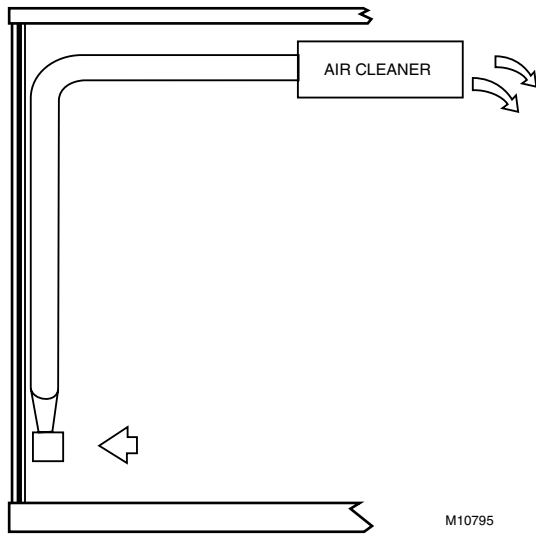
Positioning air cleaner for printing shop, brazing, soldering or gluing vapor control.
